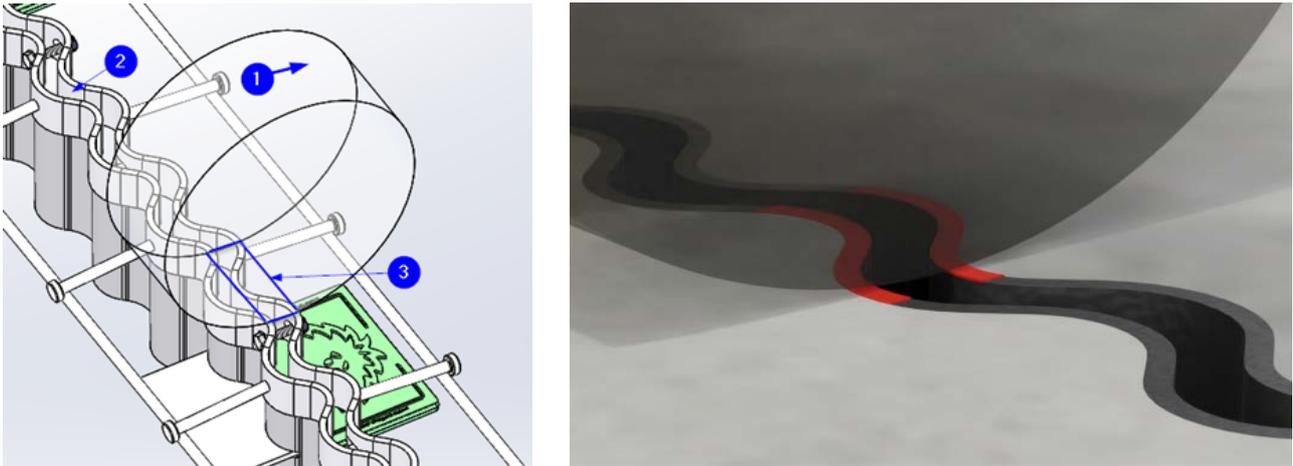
Example: Ø250 × 100 wheel ① is crossing WAVEJOINT®, joint opening 20 mm ②, pressure area of wheel 30 × 100 mm² ③. When crossing the WAVEJOINT®, the wheel carries on/from both sides of slab at the same time.
